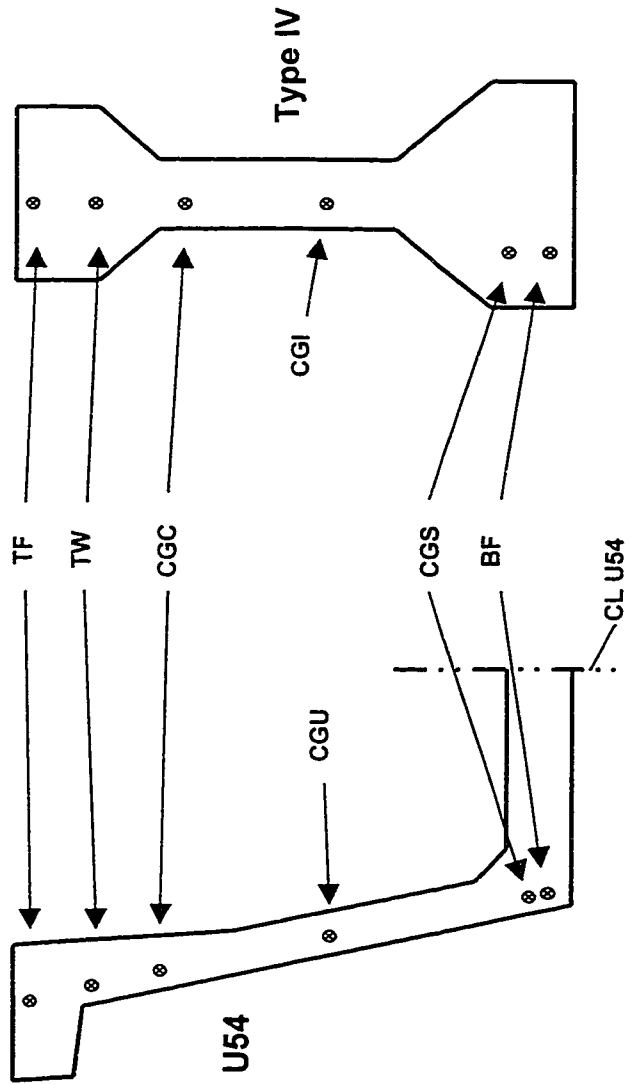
Typical Gauge Locations in Prestressed Beams
